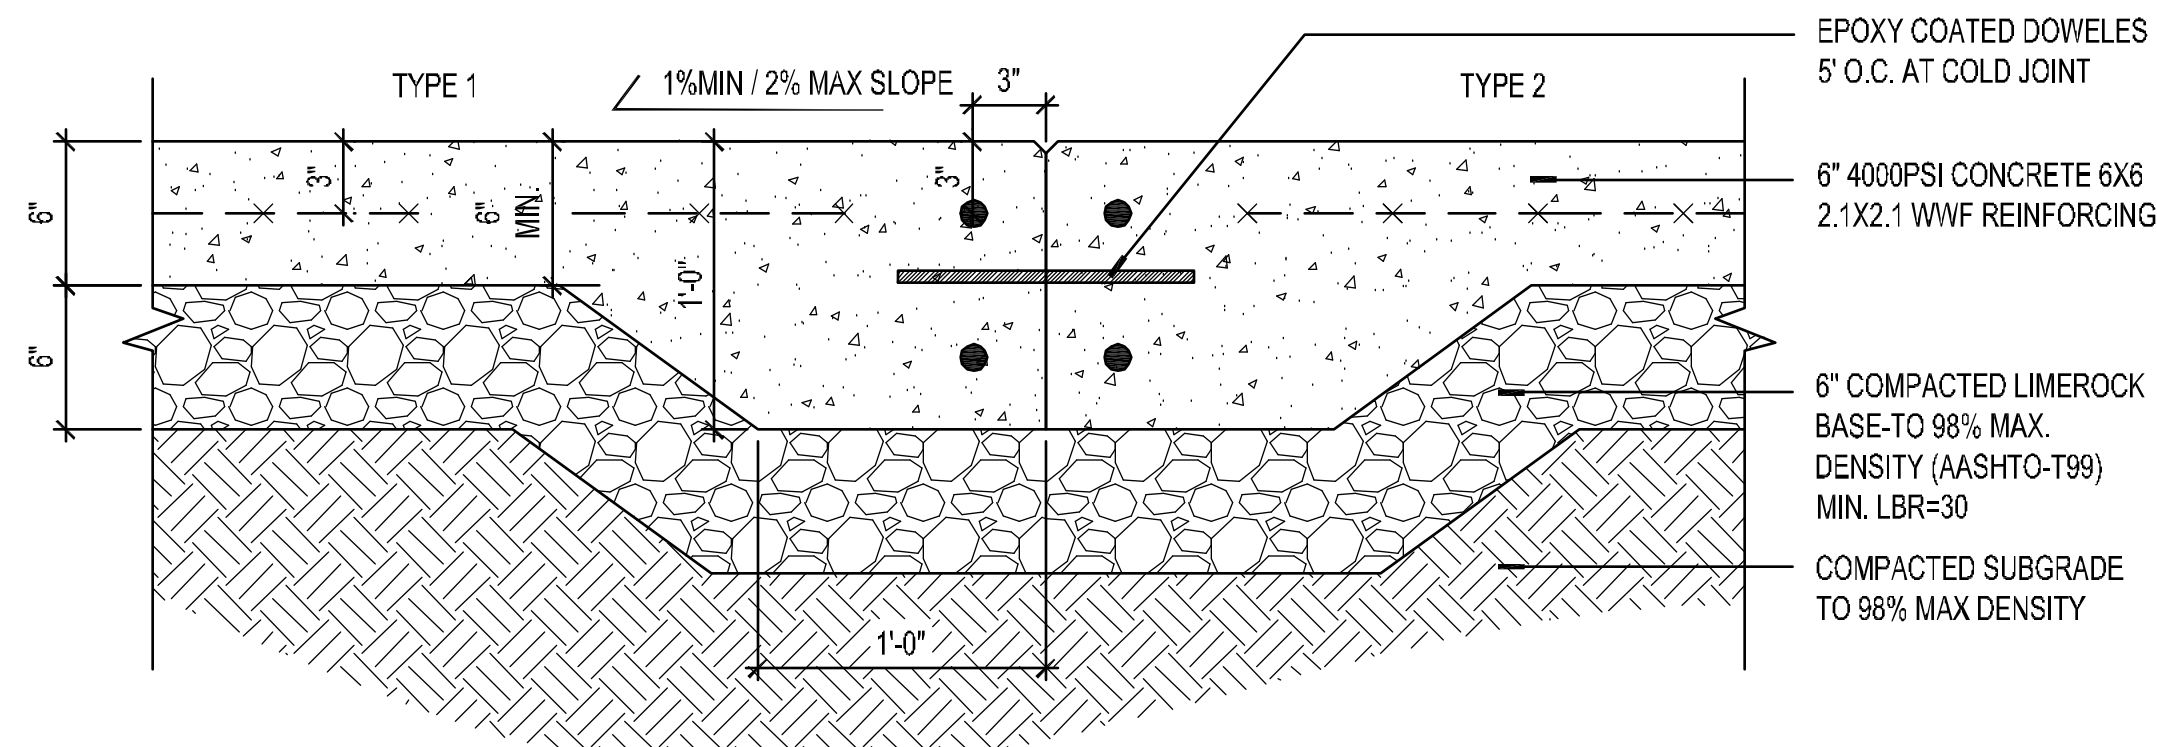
% CD Submittal Hard Landscape Improvements - Concrete Paving and Concrete Sidewalks and Curbs
